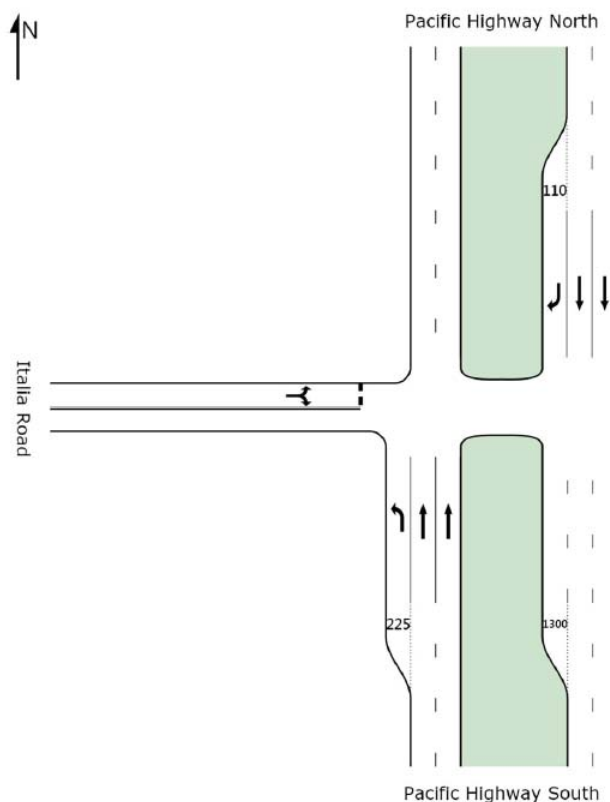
Italia Road / Pacific Highway Intersection Layout
